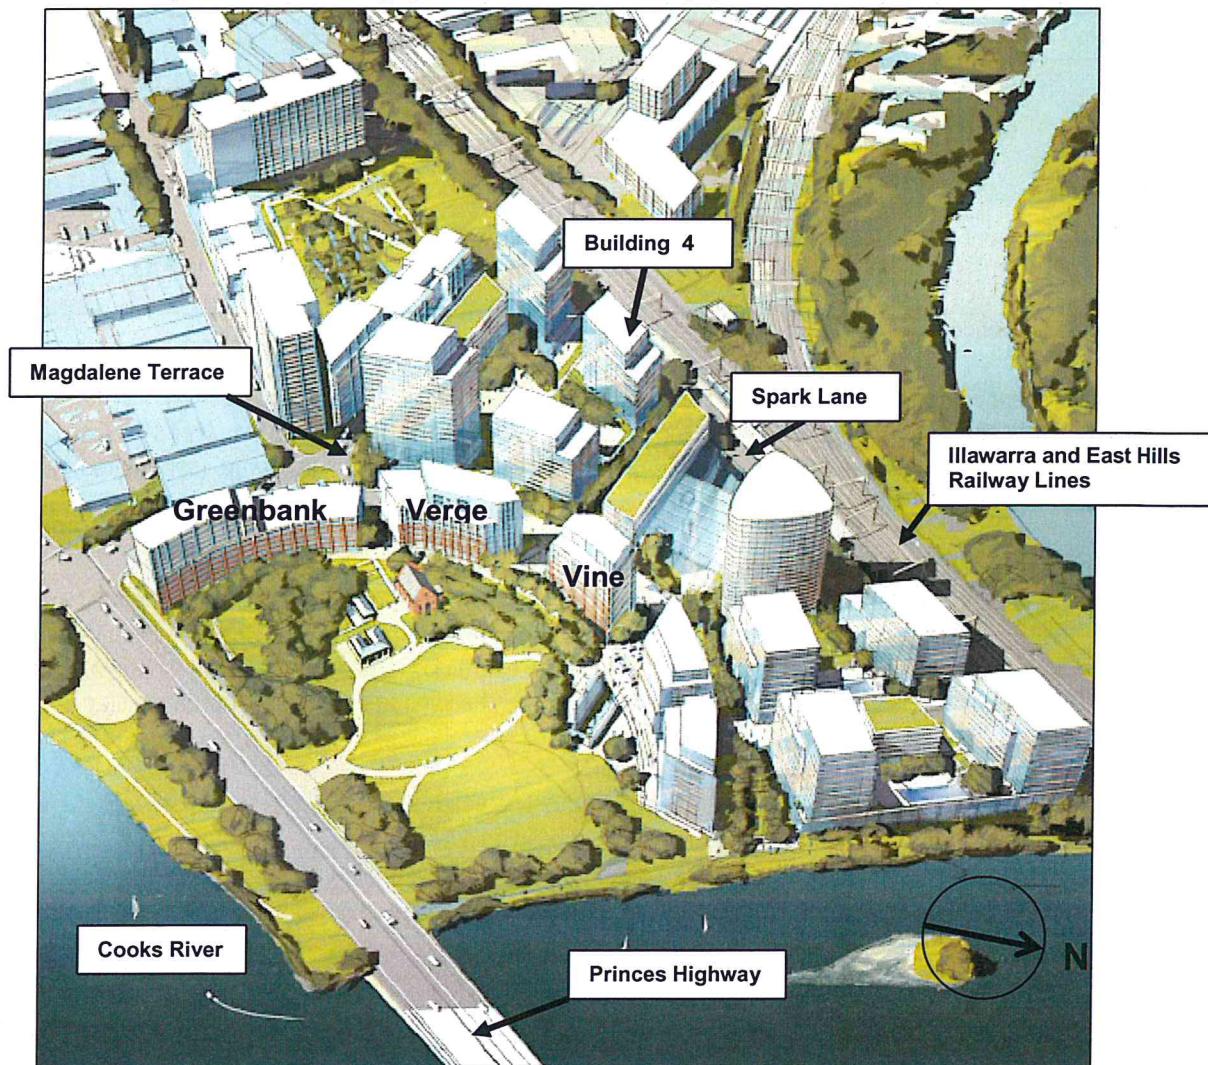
Location and Approved Concept Plan Layout of Discovery Point site
